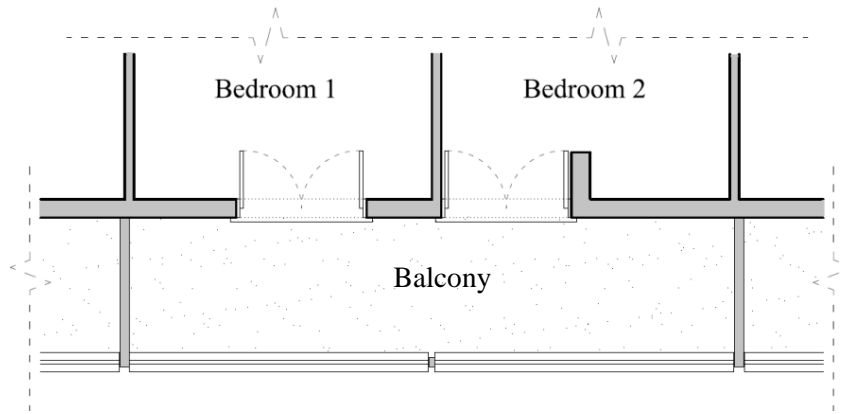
Plan view of the apartment's balcony, showing the louvres and partition walls
